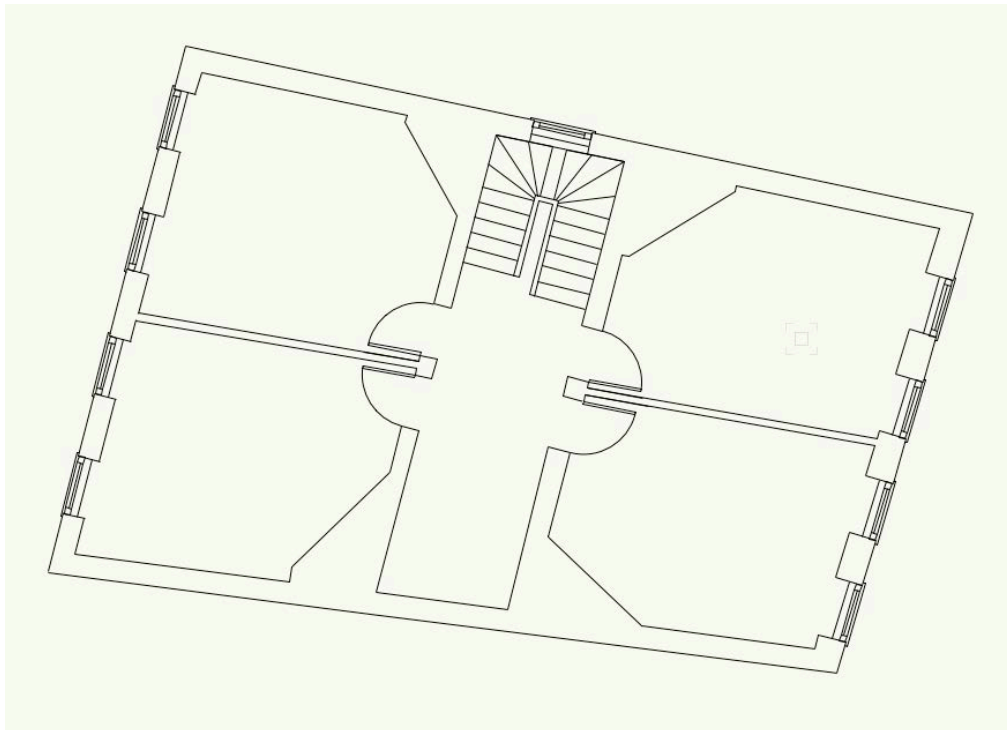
Conjectural floor plan of the first floor in No. 47, drawn by the author. This plan is based on the measured survey of the existing structure, and was developed based on the author's understanding of early 18th century domestic plan typologies, and the surviving evidence from the chimney breasts and the ca. 1960 aerial photo.
